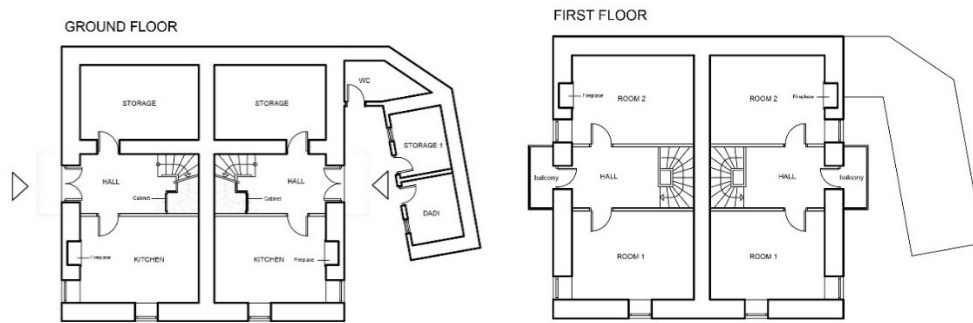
Dereköy, plan of twin houses sharing a courtyard, storage and *dadi* (drawing produced by the author after an existing survey project by the architect Işın Kaplan)
